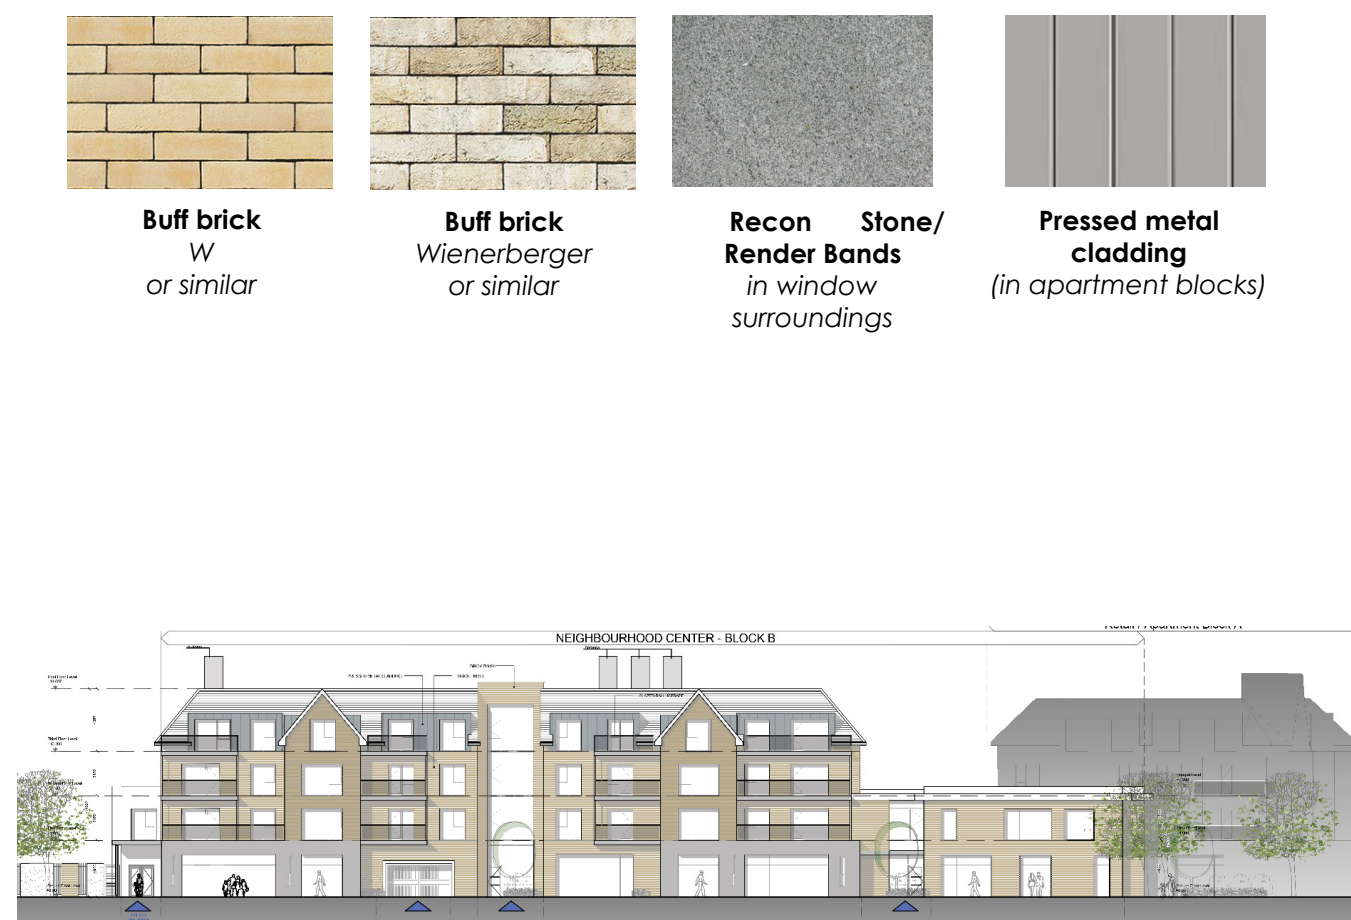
Front elevation of Apartment Block B of the Neighbourhood centre.
